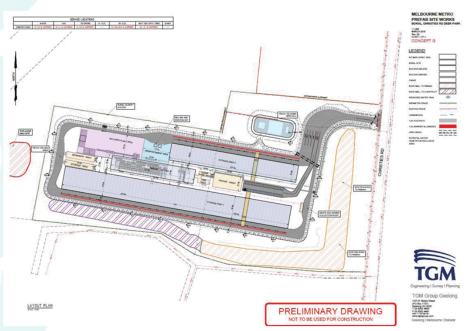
RAVENHALL CONCRETE SEGMENT MANUFACTURING FACILITY CONCEPT DESIGN
